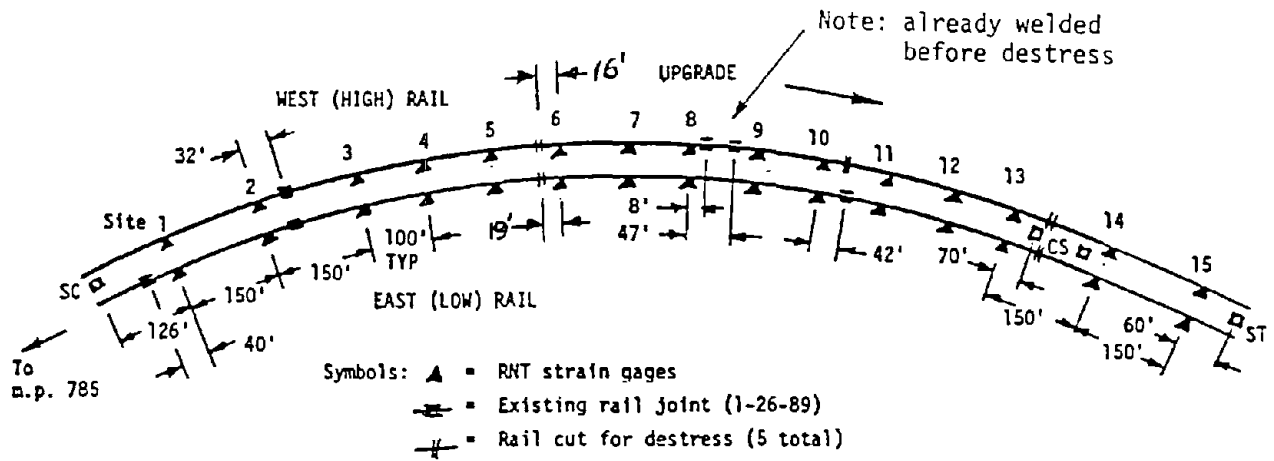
INSTRUMENTATION SITE LAYOUT IN CURVED TRACK SECTION
